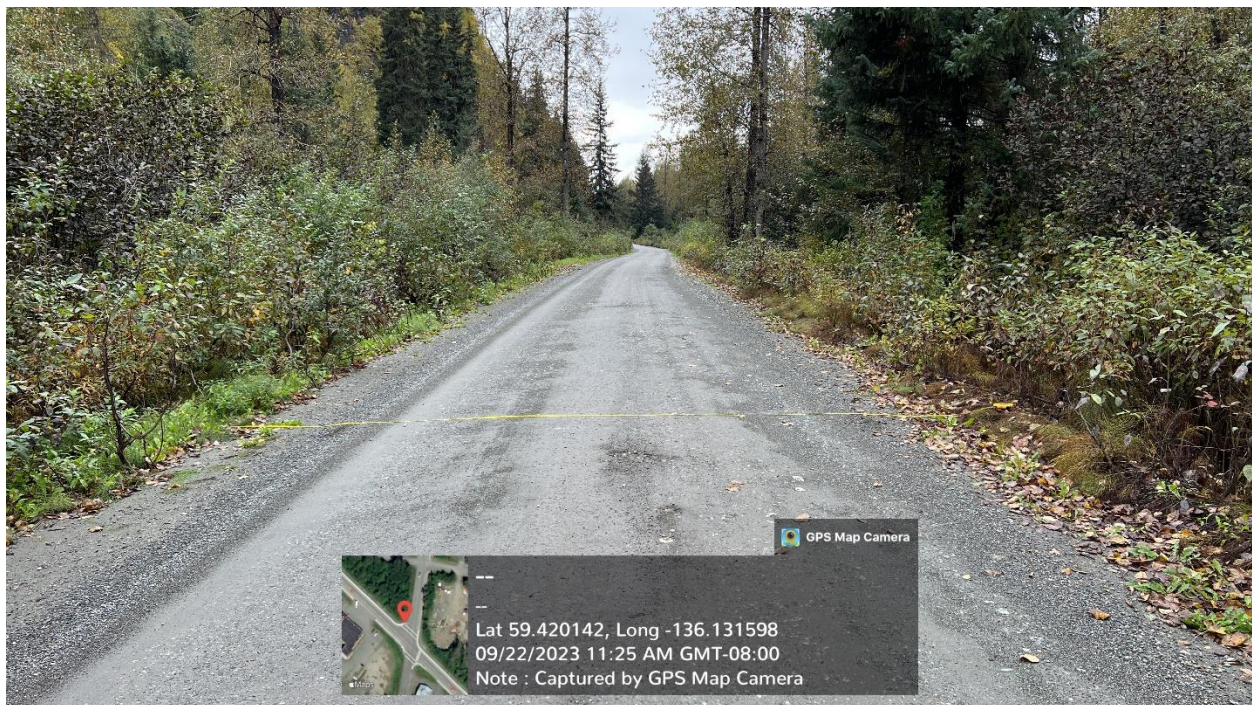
Another example of existing, pre-disaster condition of Porcupine Trail Road outside of Phase I and Third-Party work limits. Edge of shoulder to edge of shoulder width is 24’ at this location, and width to outside edges of travel lanes (driving surface) is 16.4’. Adjacent existing ditches are not included in these measurements. Photos of measurements can be provided upon request.
